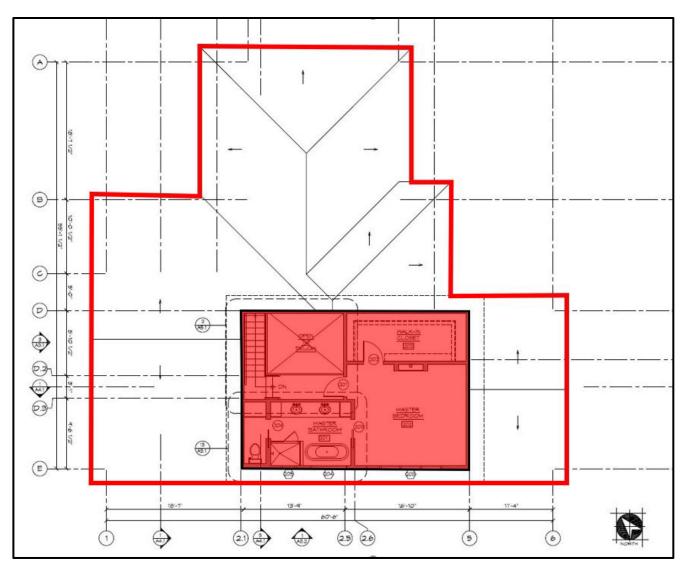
2nd story floorplan of the proposed development with additions shown in red
